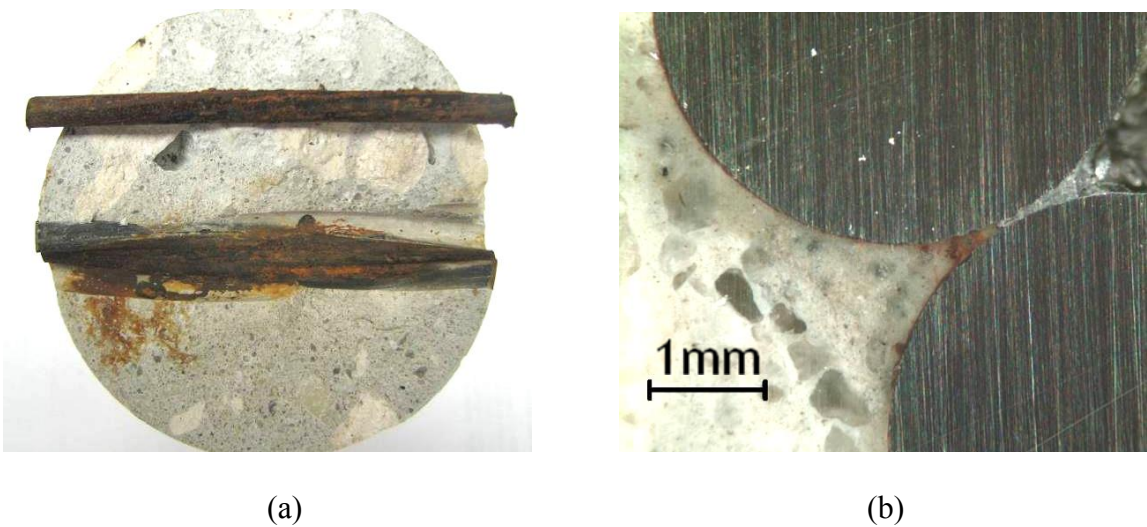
Corrosion of prestressing steel in extracted core
